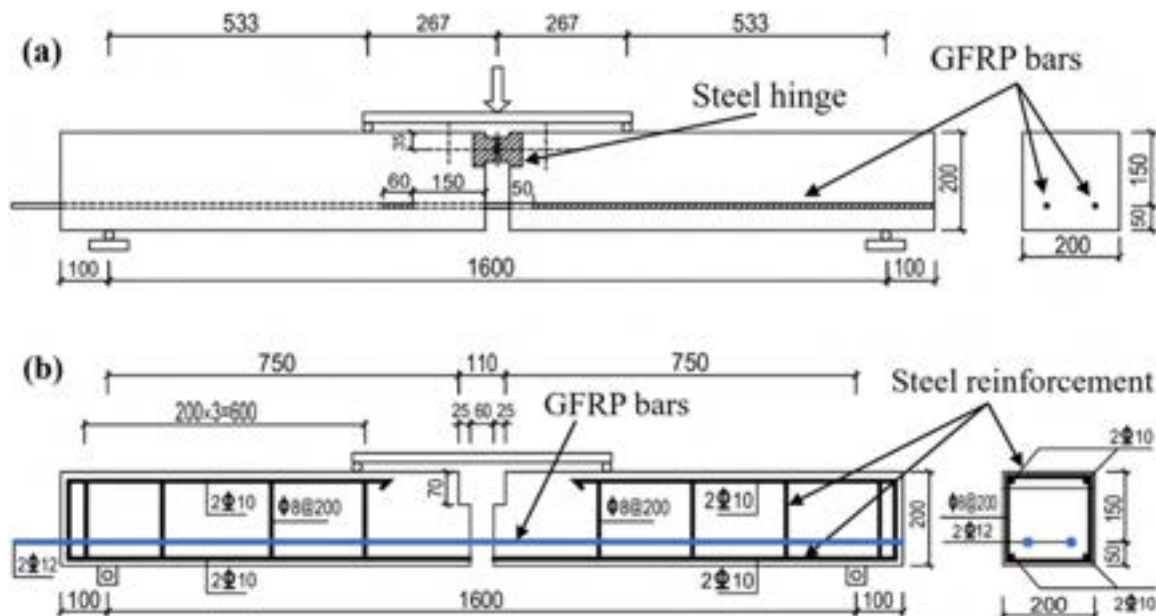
Beam geometry and reinforcement (Unit: mm). (a) GFRP bars; (b) Steel reinforcement.
